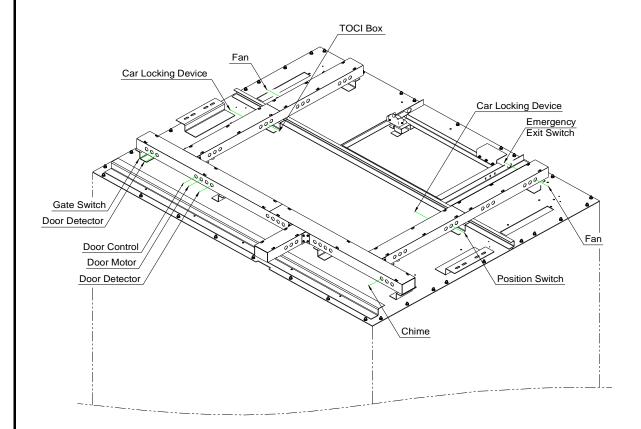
INSTALLATION OF CAR TOP CEILING DUCT
